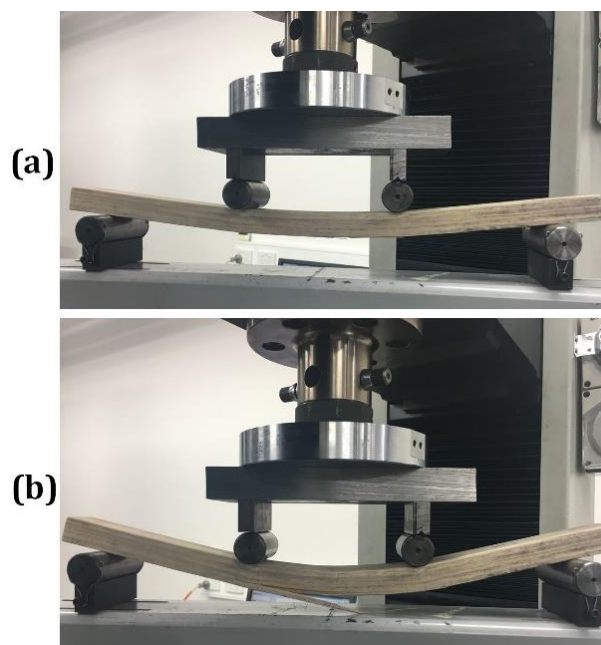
Four-point flexural testing of LVL specimen. (a) Low deflection. (b) First fracture of the specimen at the bottom ply.
